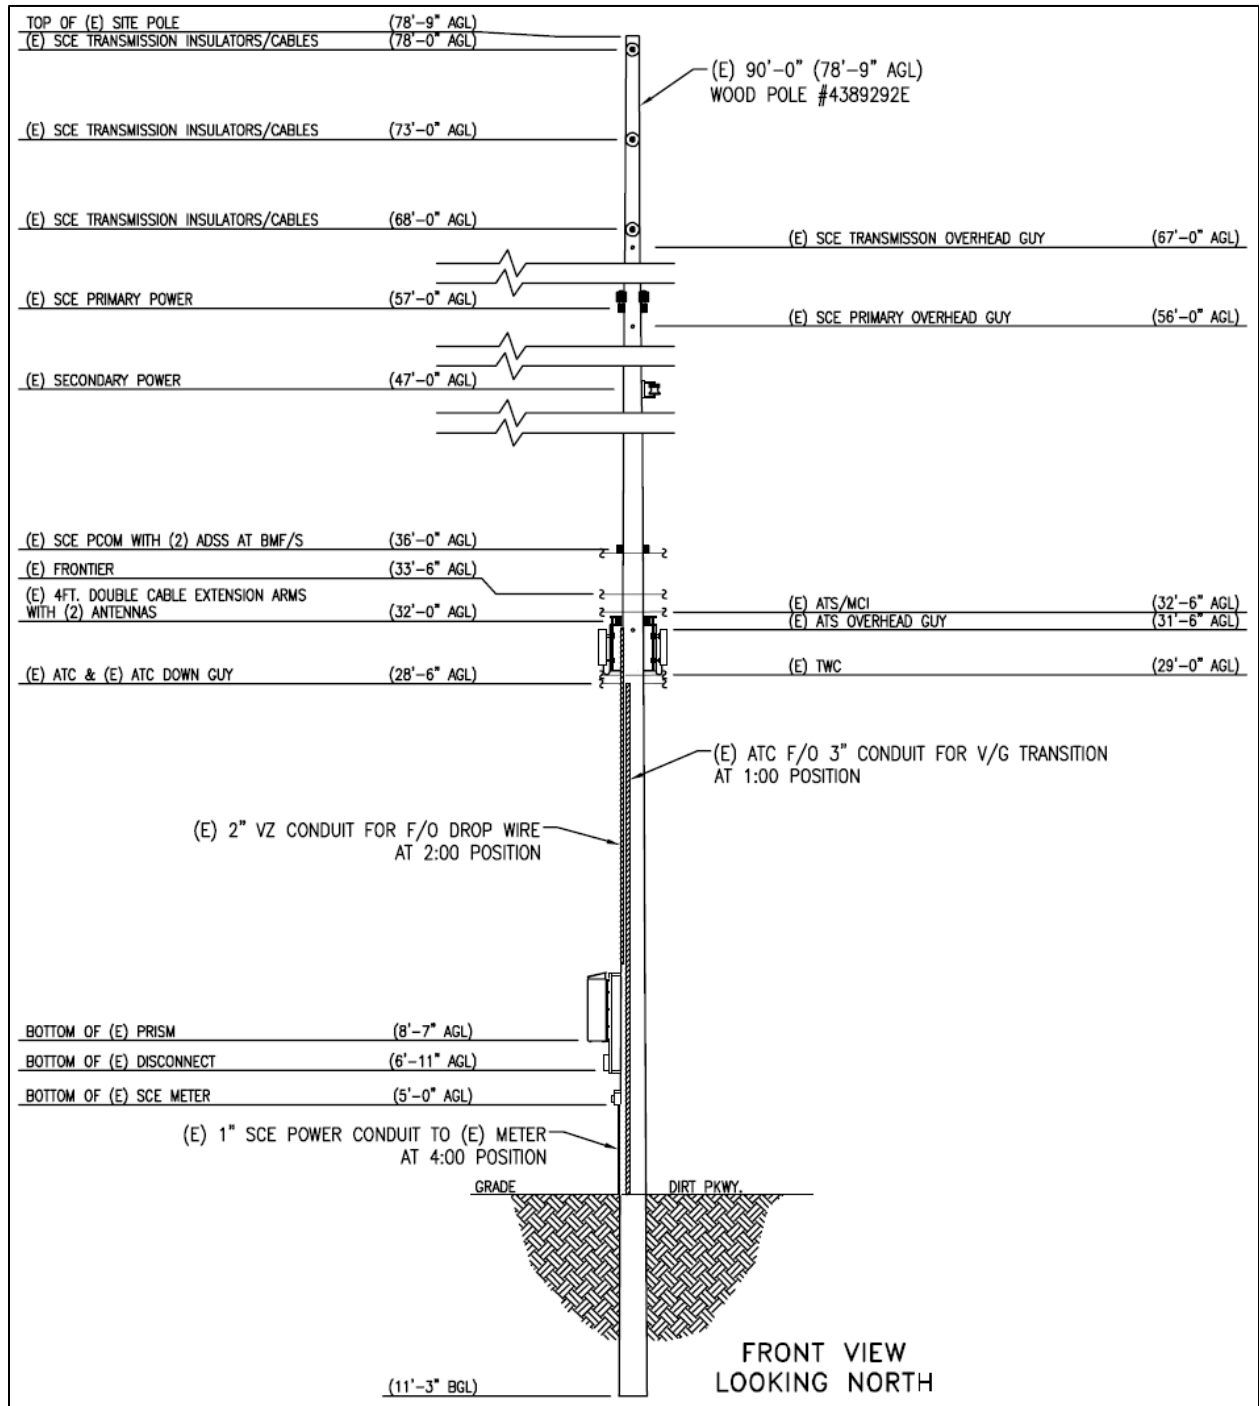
Elevation view of Verizon’s existing wireless site. (Source: Plans, page A-3, panel 3).
